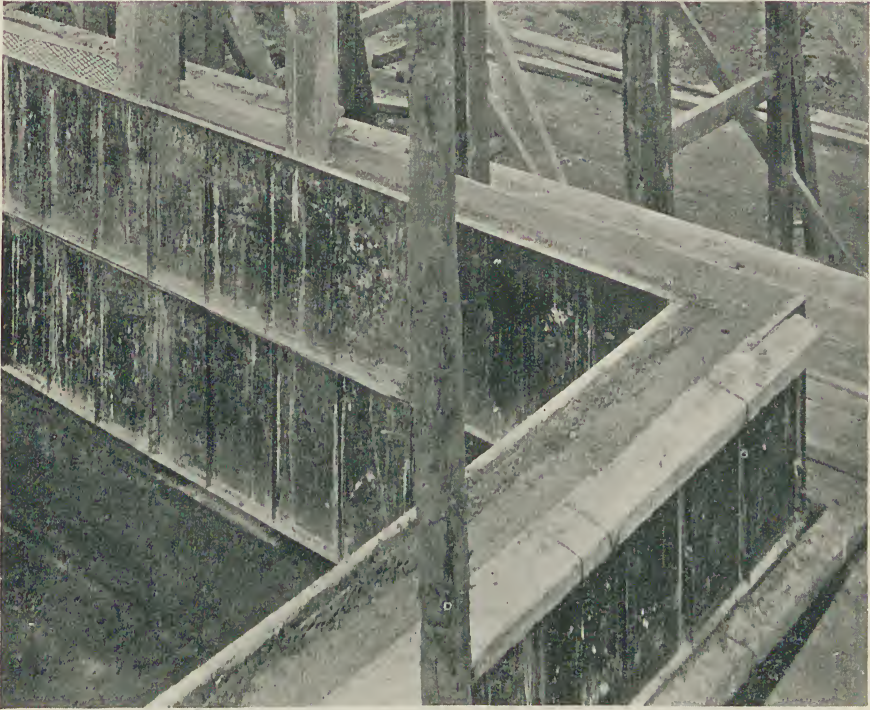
STEEL SHUTTERING USED IN THE CONSTRUCTION OF EXTERNAL WALLS OF TWO MATERIALS.
